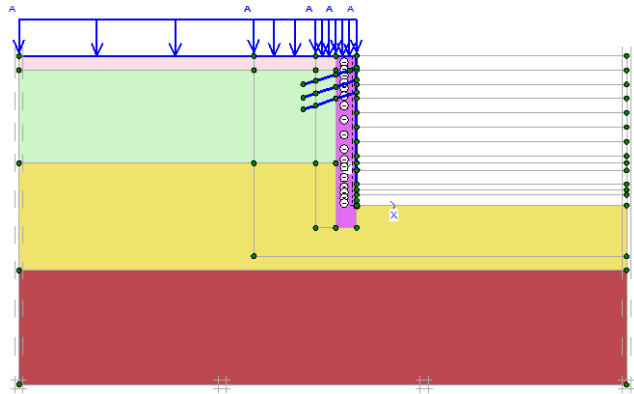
2D Model: transverse walls with combined nailing and plastic concrete pile method.
